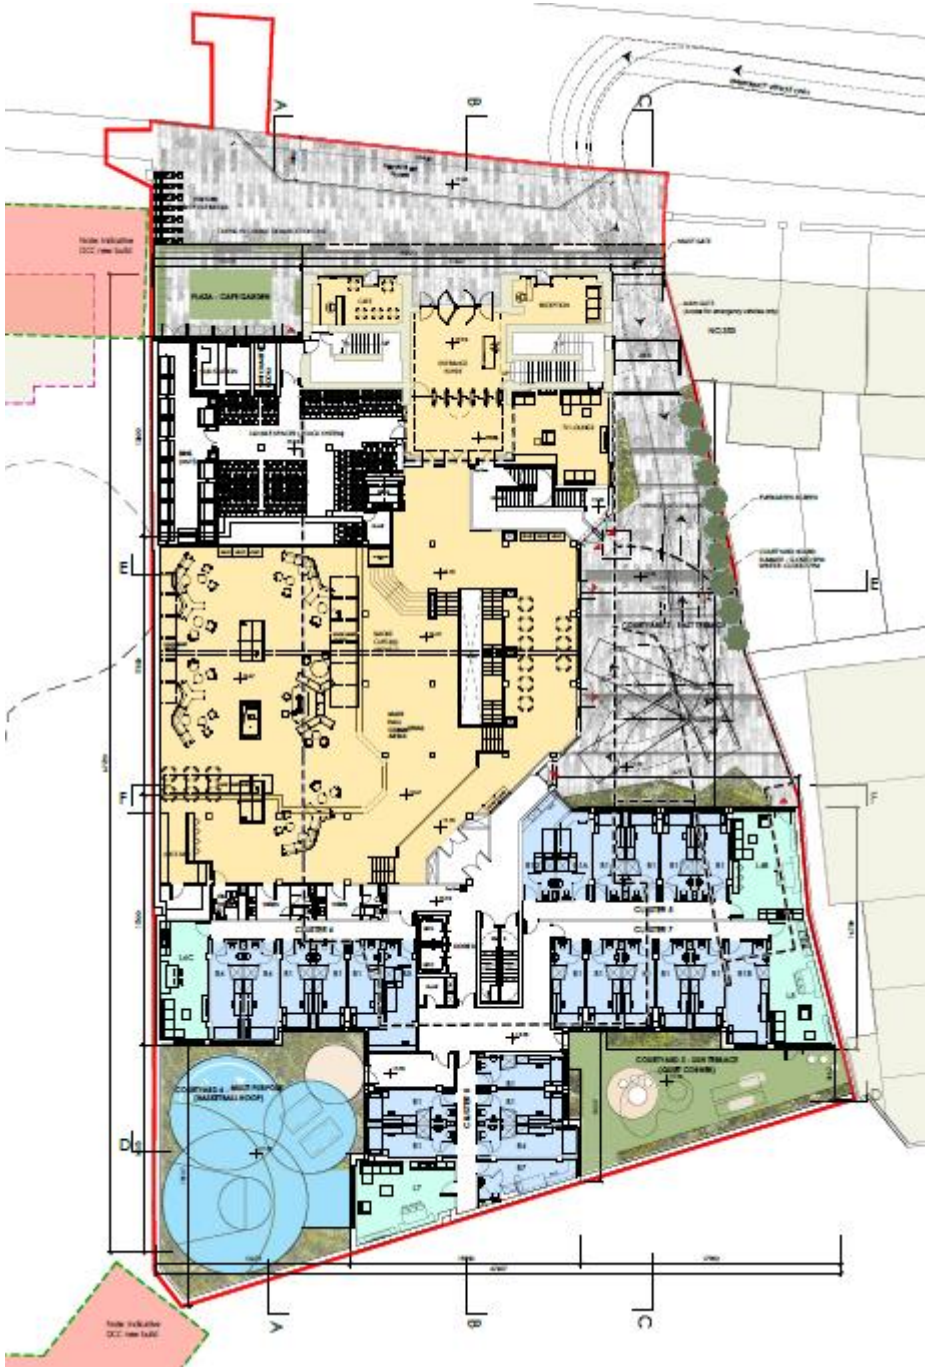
Architectural Ground Floor Plan Lvl. 0
